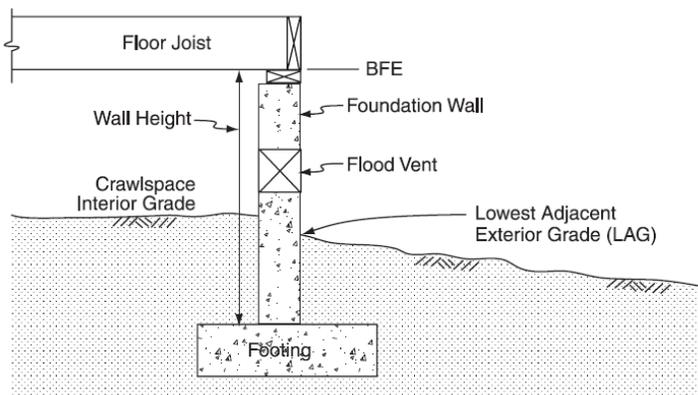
Interior grade of the enclosed area (i.e. crawlspace) is above the exterior grade in order to avoid flood waters from accumulating inside of the building. Source: FEMA Technical Bulletin 11 (2001)
